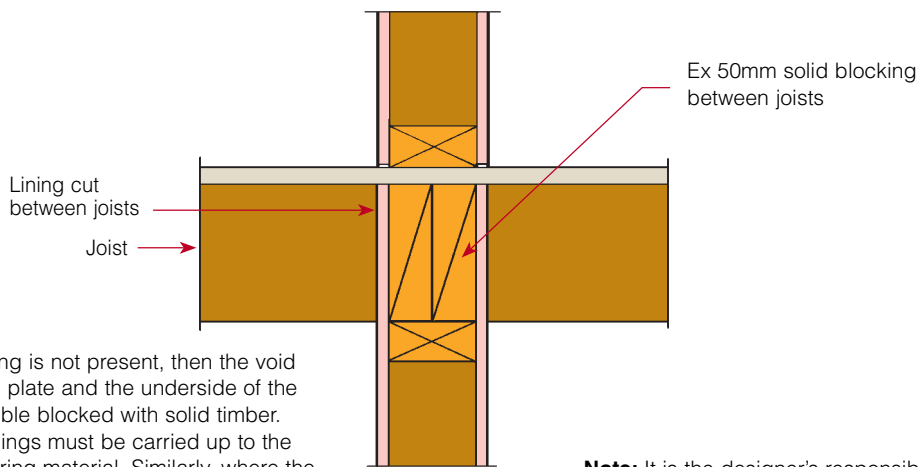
If a ceiling lining is not present, then the void between the wall top plate and the underside of the flooring must be double blocked with solid timber. The fire rated wall linings must be carried up to the underside of the flooring material. Similarly, where the firewall runs directly underneath the joists, the joists must be lined in the same manner.
